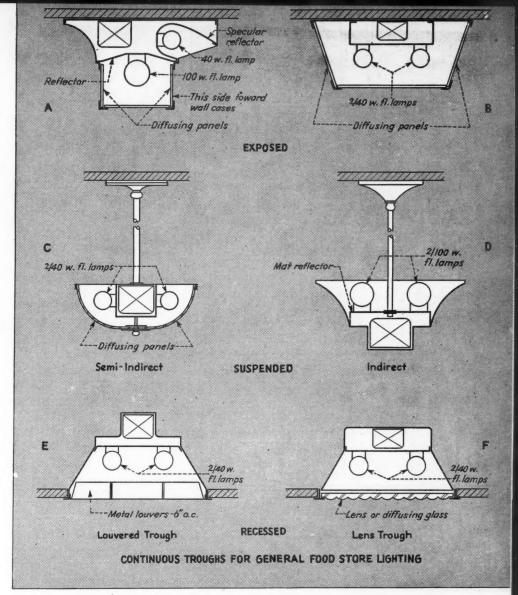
Continuous troughs installed on correct spacings for uniform illumination provides ideal lighting for food markets. Type A unit should be installed four to six feet from wall with open reflector towards wall.
